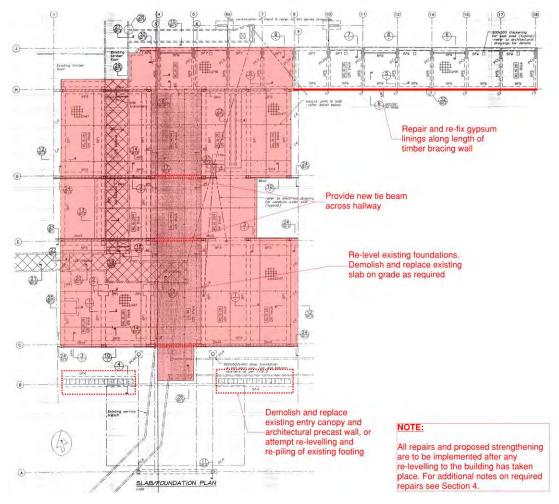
Foundation / Ground Floor Plan - Required Repairs
